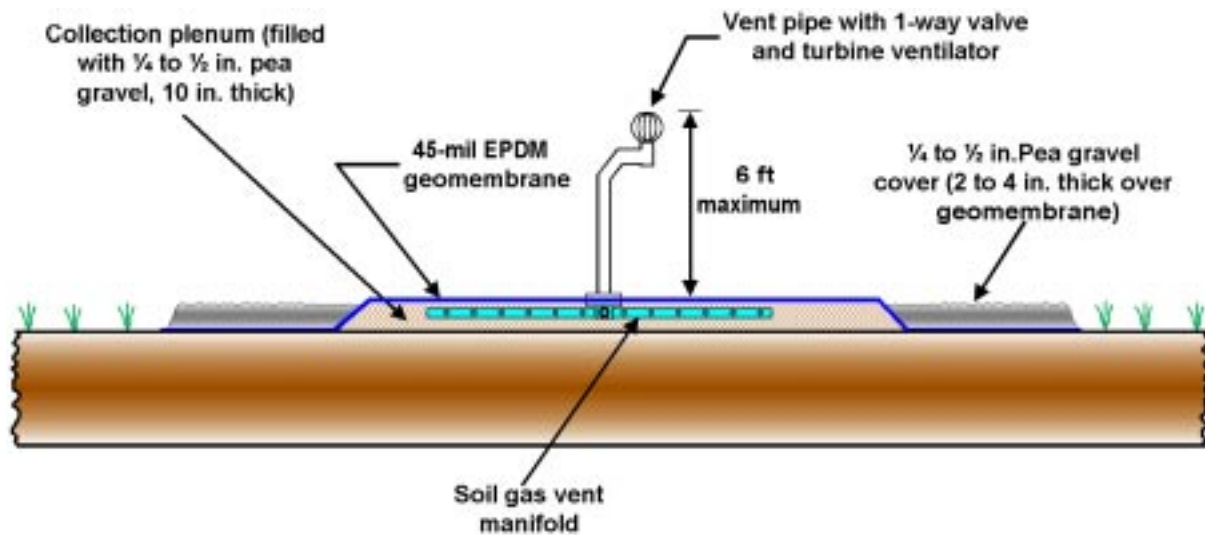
Vent pipe and original plenum configuration for demonstration at INEEL RWMC Pit 2.
